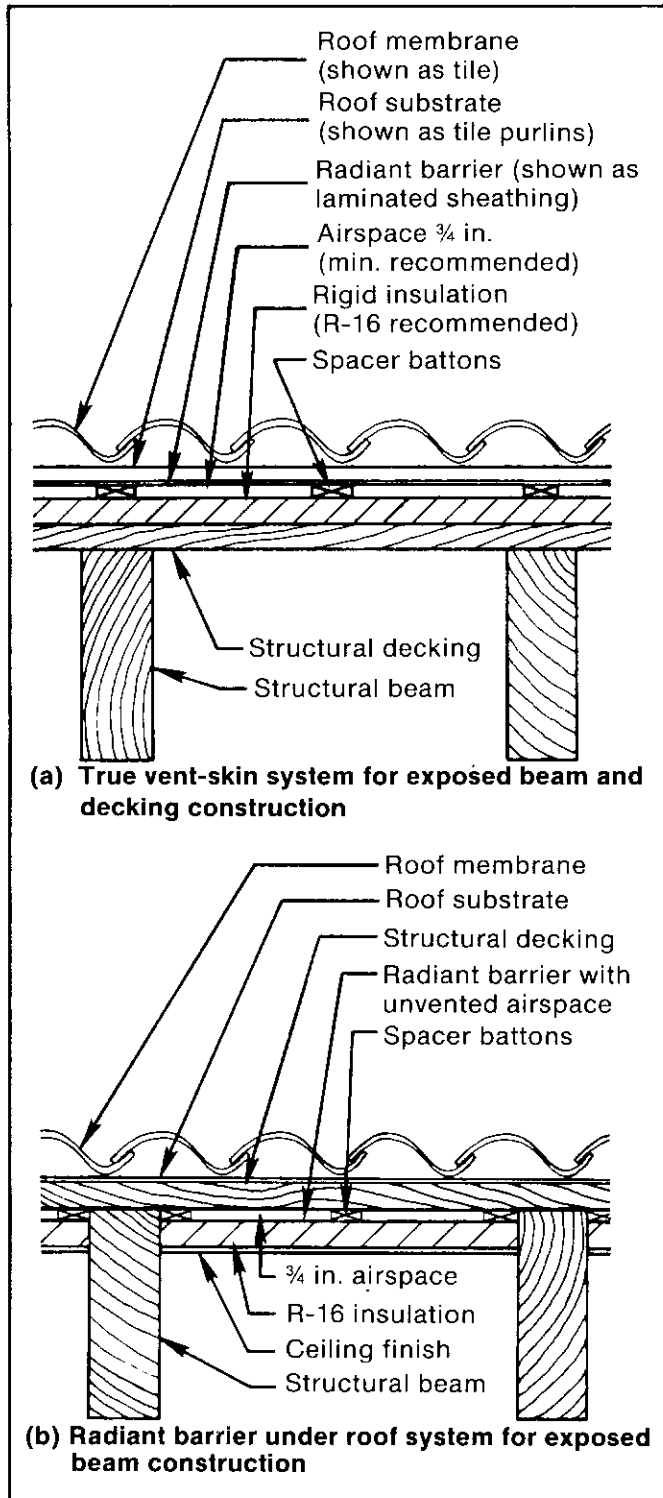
Constructions for Exposed-Beam Cathedral Ceilings
